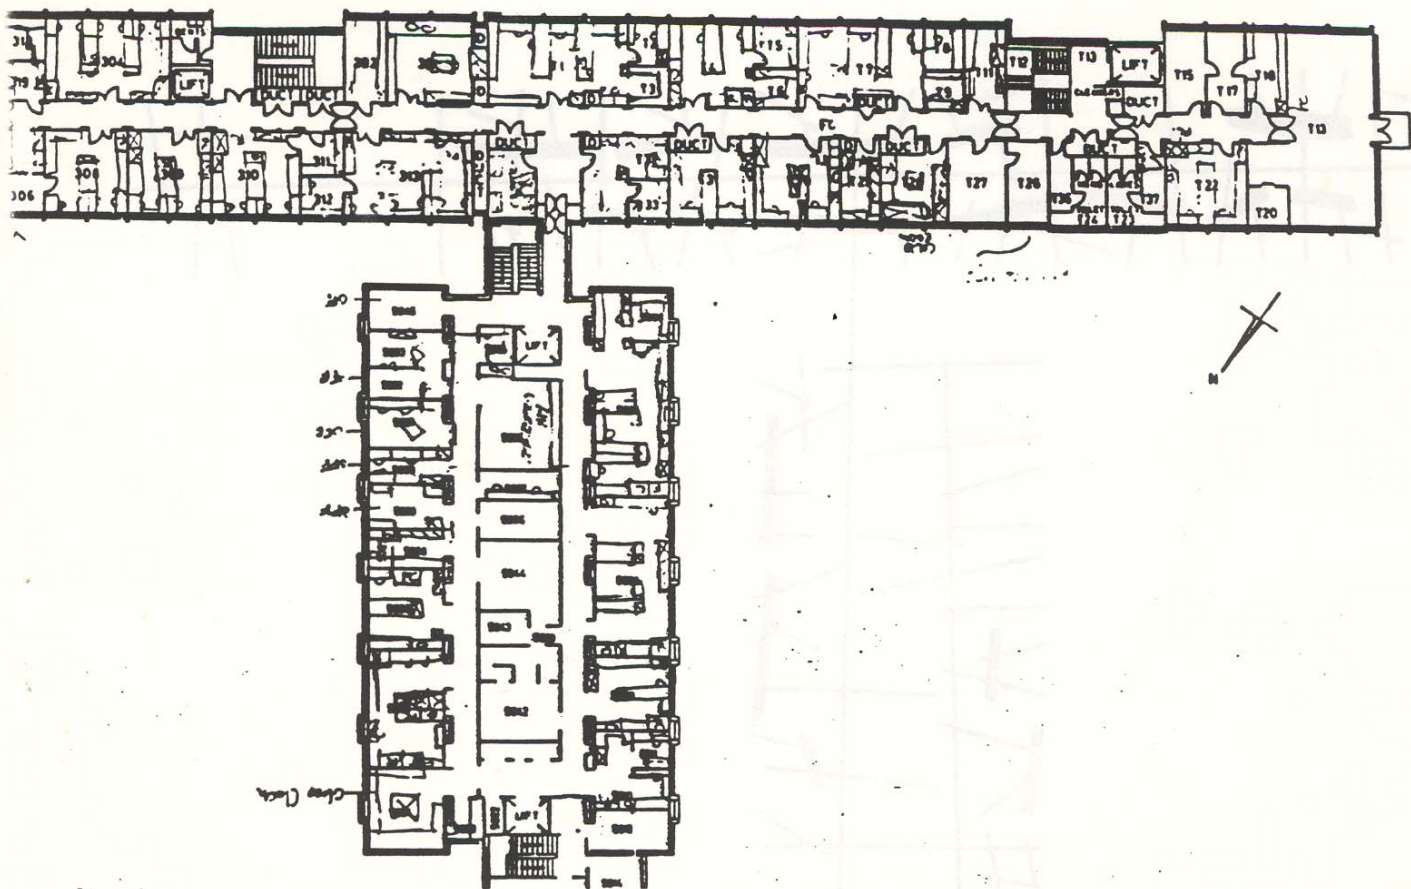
Layout of 3rd floor at MRC showing the old building (horizontal section) and new section (vertical section below)
